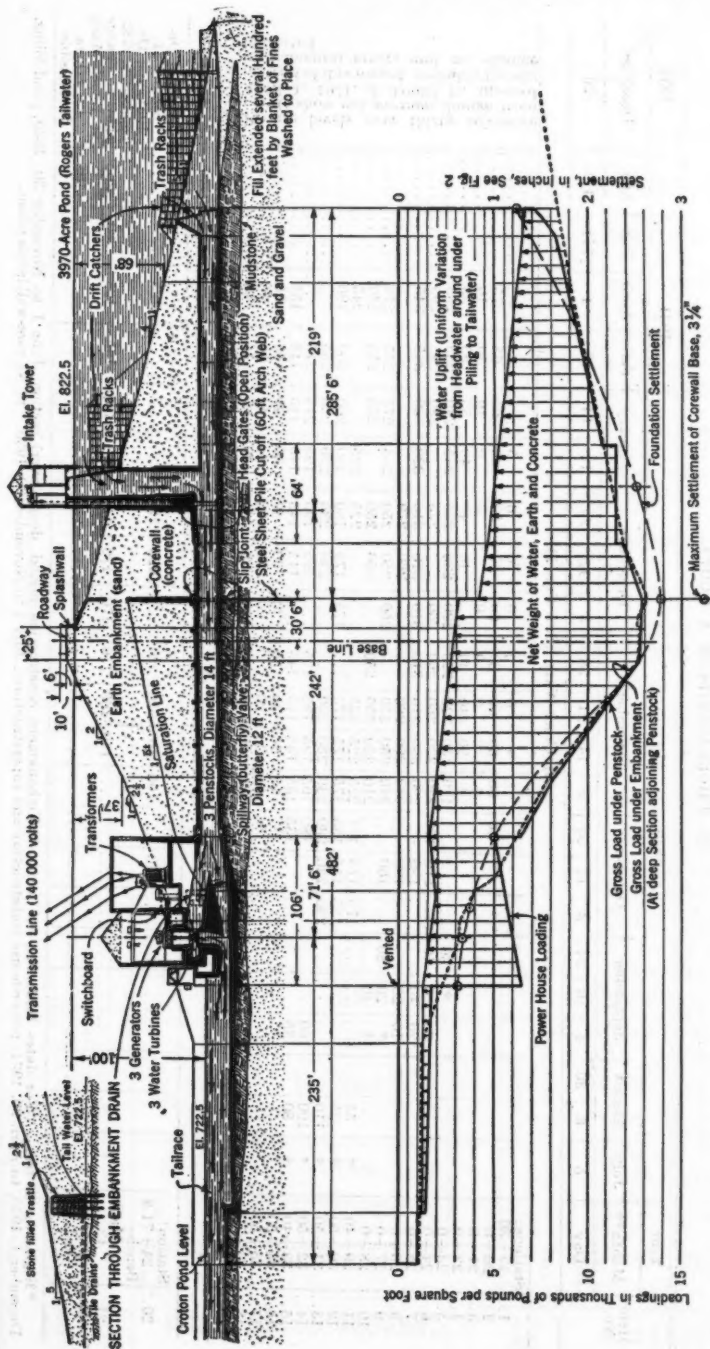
CROSS-SECTION AND BASE LOADING OF HARDY DAM
